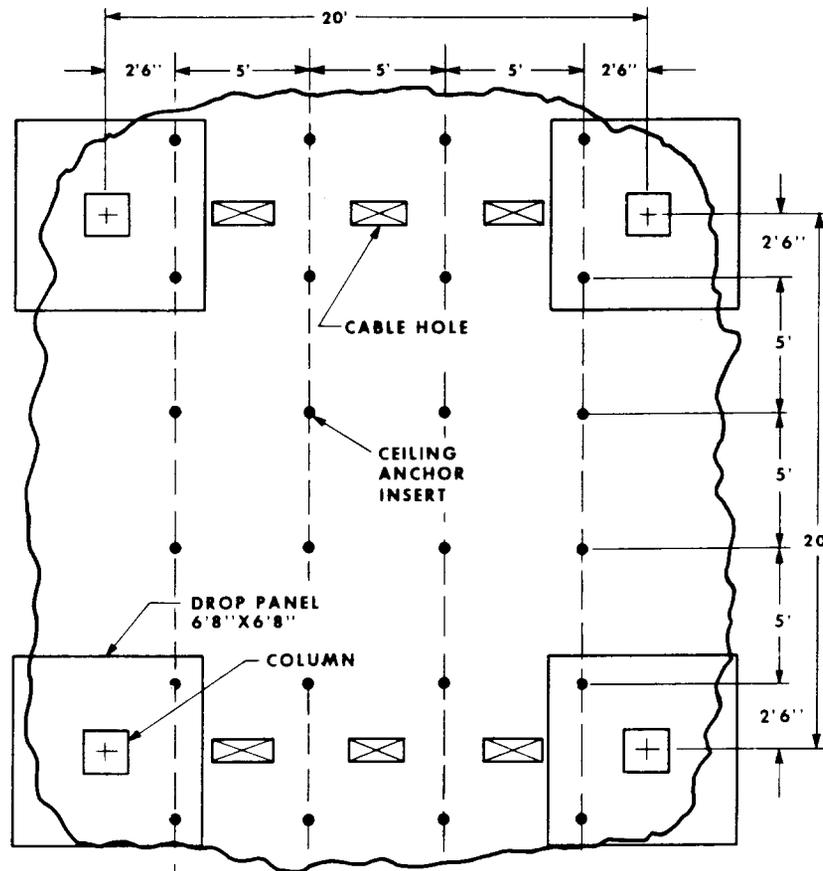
Section of Equipment Room, Showing Location of Anchors
